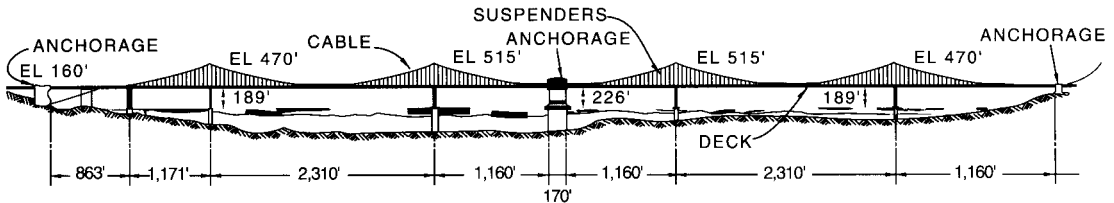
San Francisco-Oakland Bay Bridge.
